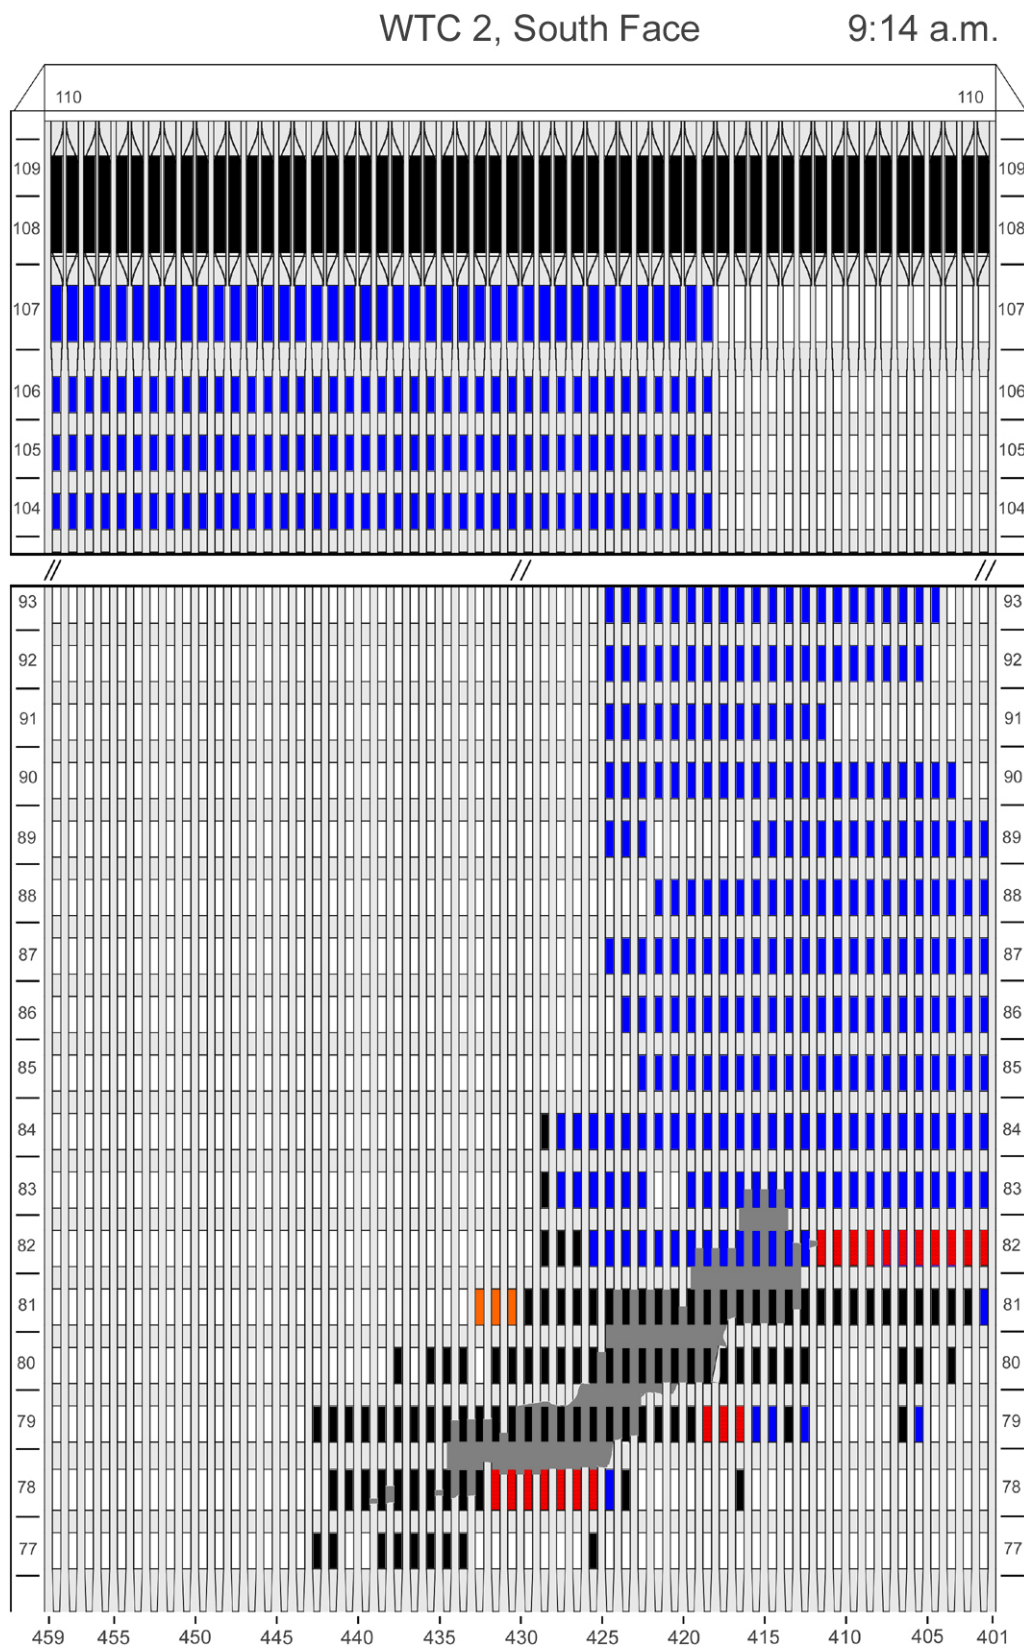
Diagram of the south face of WTC 2 for floors 77 to 93 and floors 104 to 110 at 9:14 a.m. showing the condition of windows and locations of fires.
